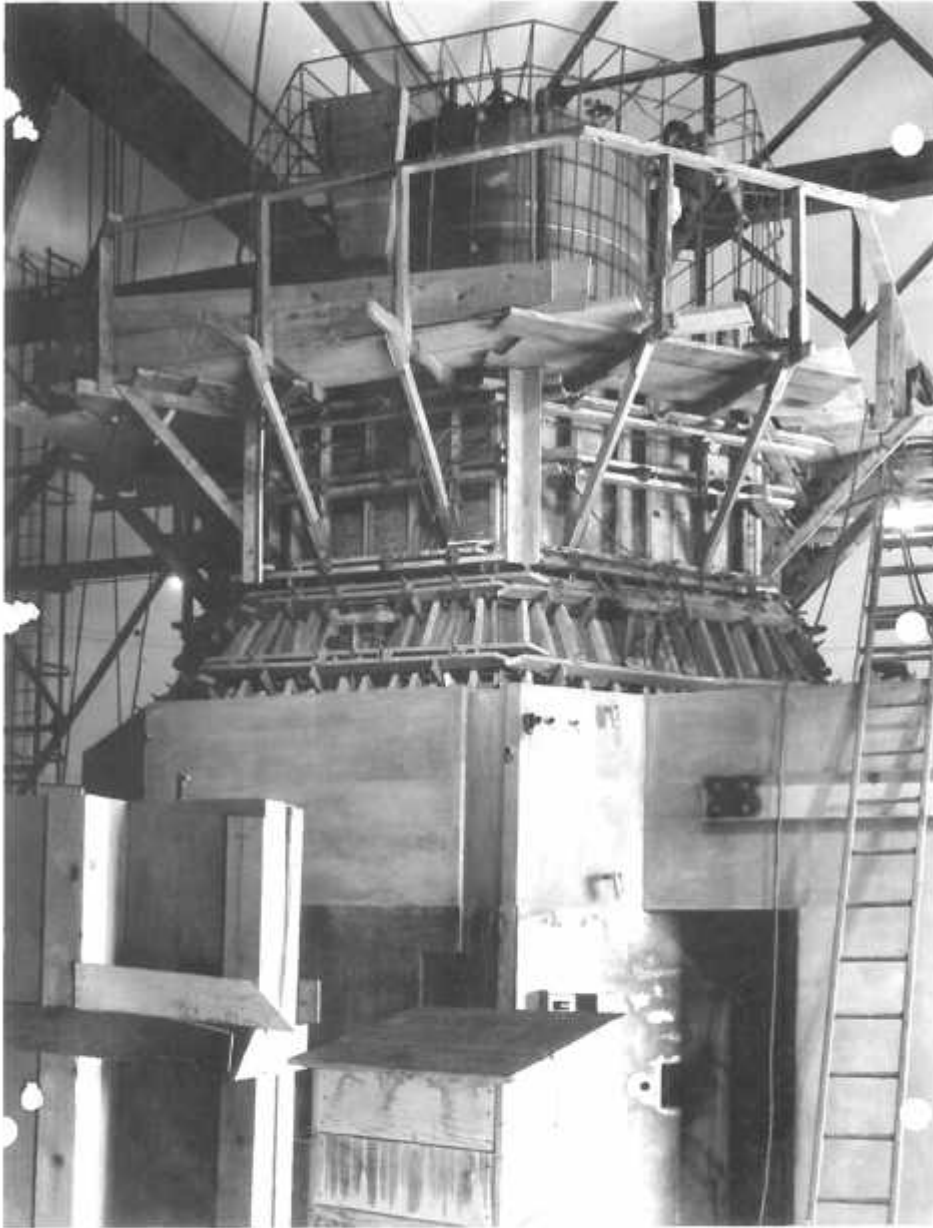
Reinforced, board-formed concrete construction of the LPTR core, 1956. LLNL Archives.
